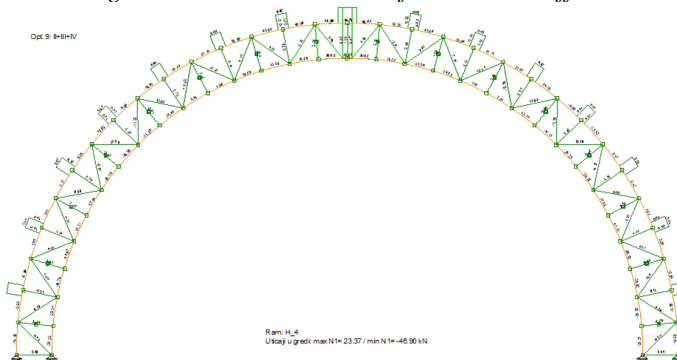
Member forces in the truss from the load FCE+RC arch+RC ridge beam
